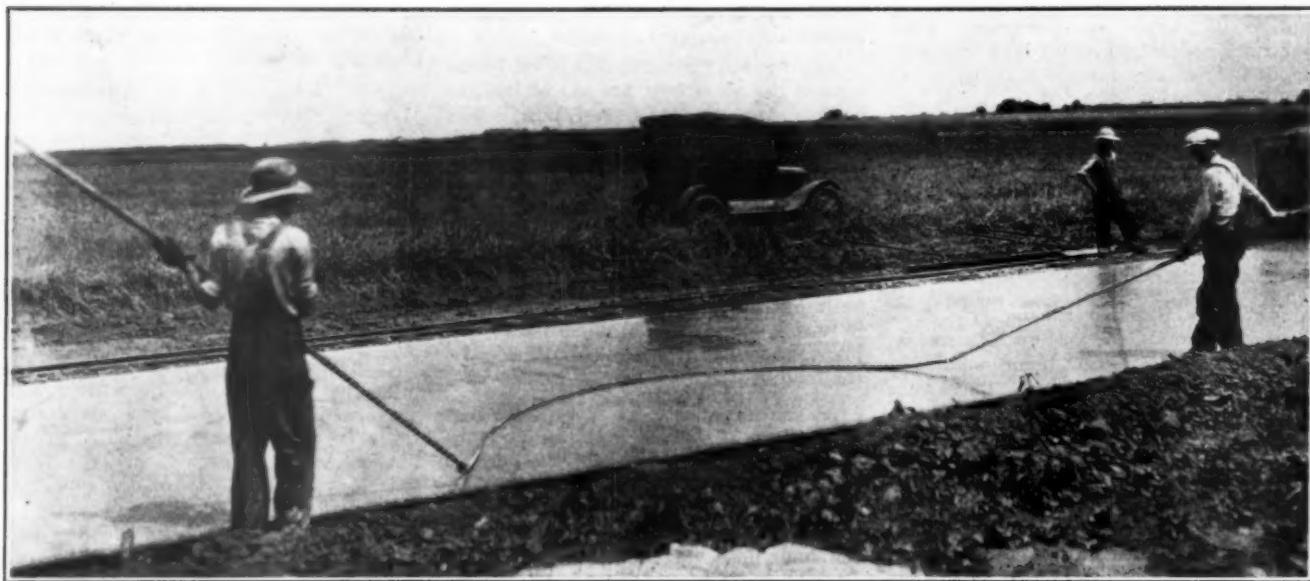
Surfacing the Pavement with a Length of Rubber Steam Hose
